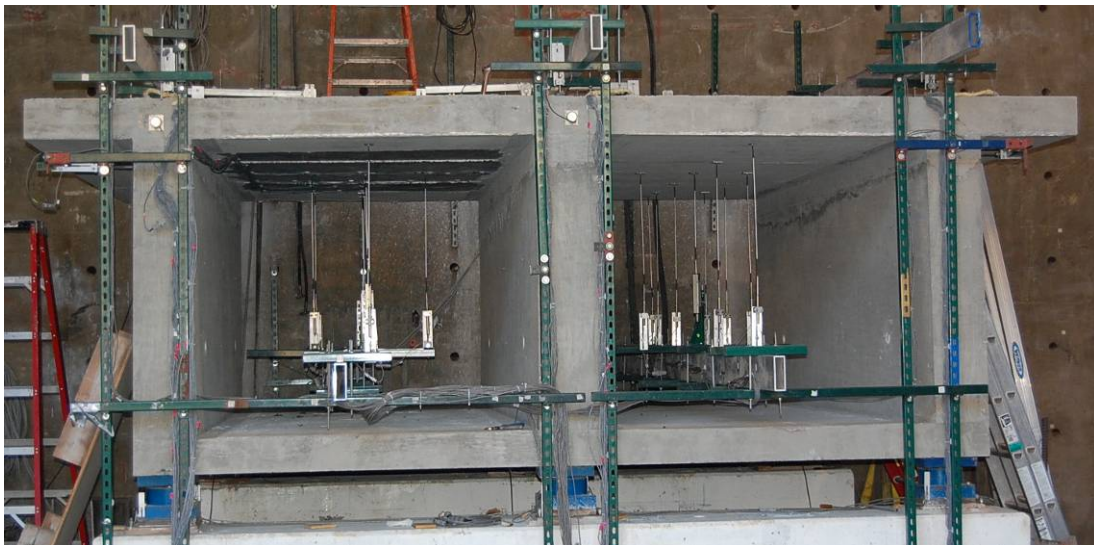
Test specimen with instrumentation, prior to installation of actuators
